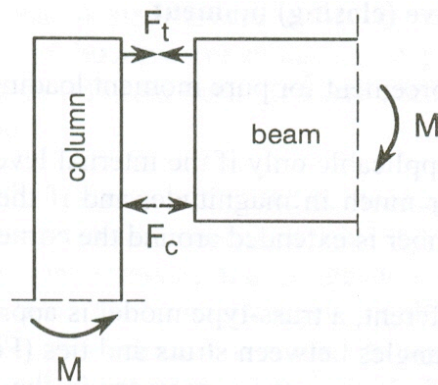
Shear in the corner region of a beam-column-connection
